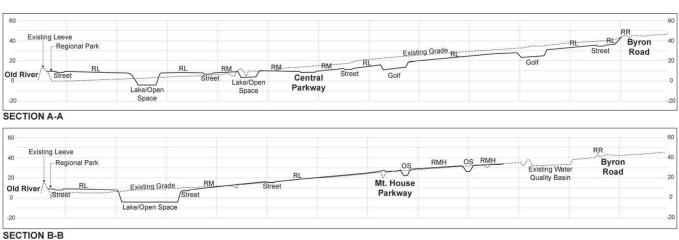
NORTH AREA GRADING SECTIONS
